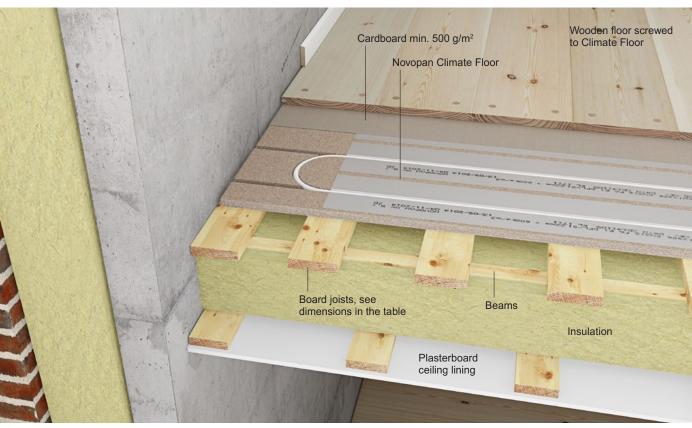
Novopan Climate Floor laid on load-bearing substrate of boards and finished with a wooden floor screwed to the climate floor.
